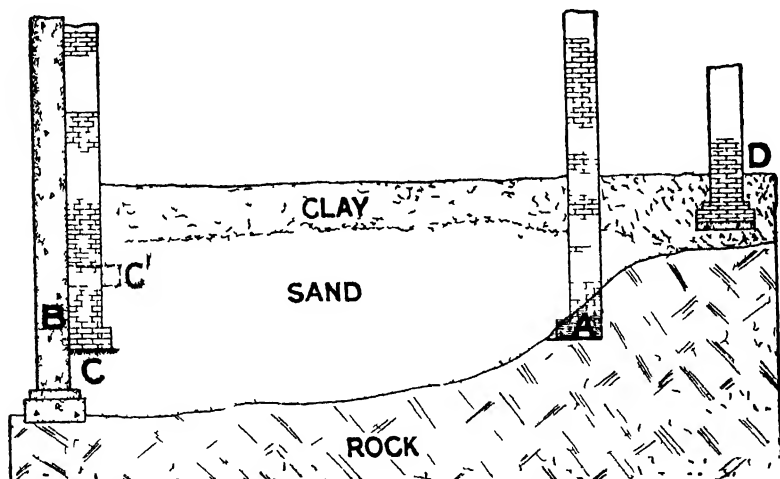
Section of foundation showing at A a rock condition below a sand stratum sloping at a point where a foundation base must be placed in order that it is level for it to avert any possible danger of its creating a pressure against the resting sand by which it might yield upward where not under compres. on other than its own weight thus allowing ease to slip and cause disaster. If it is to be placed against another wall as at B it will be safe to lay the base at any depth below from it in the sand as at C. The sand cannot yield or be displaced unless voids are created. At D the rock bed is quite level and the clay rests upon it, here the base of foundation may start even without going to rock bottom and be perfectly safe.
